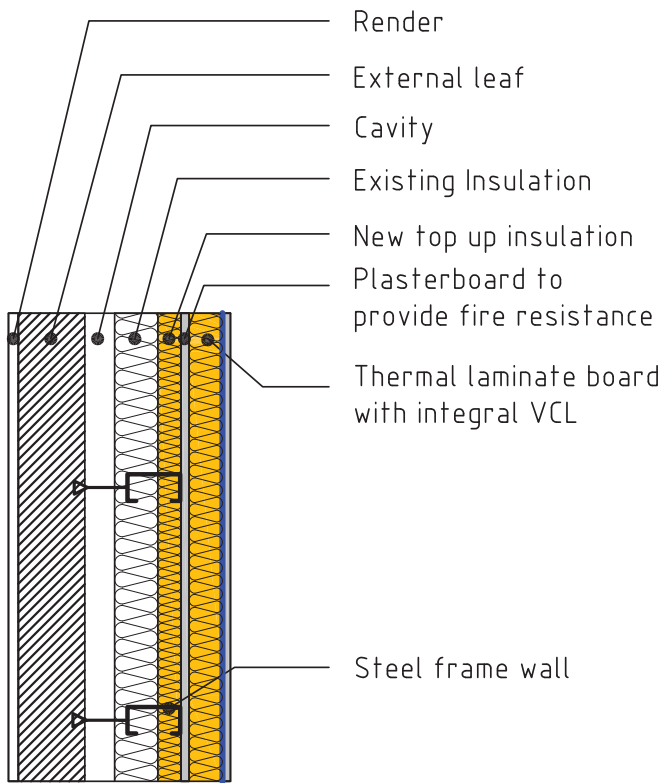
Steel frame, partial fill with top up and thermal laminate (plan view)
